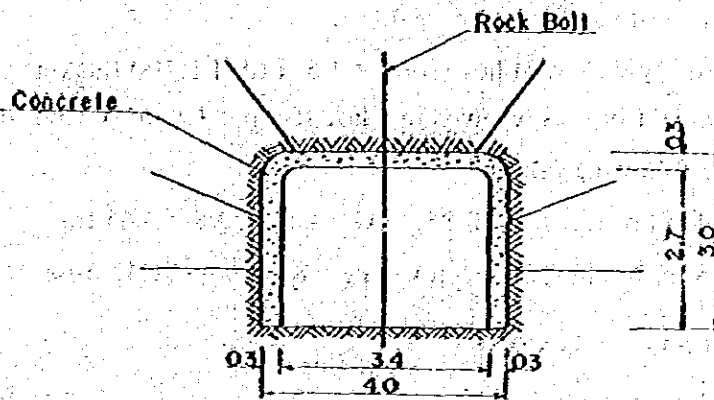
16 Section of Draw Point (Unit : m)
